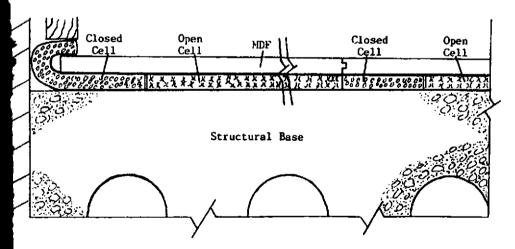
Section through Shallow Profile Platform Floor showing edge and board joint details
